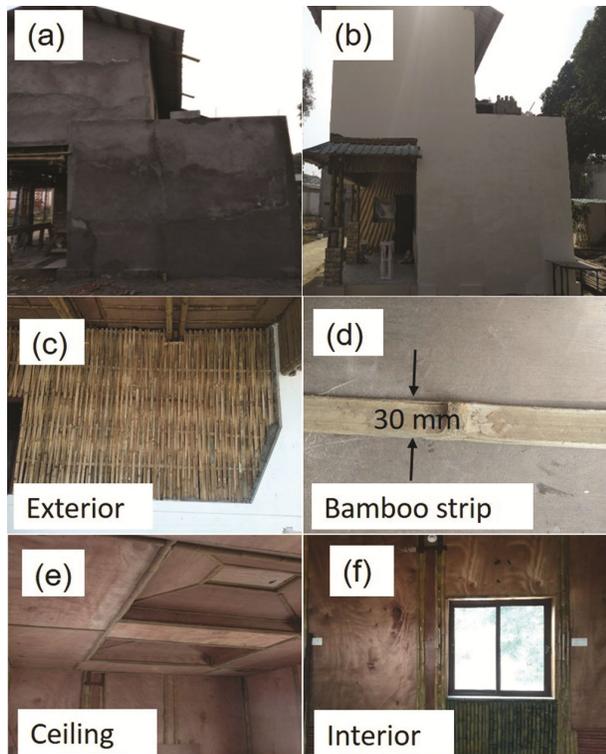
(a), (b) Mortar finishing of bamboo building, (c) exterior wall of bamboo building, (d) bamboo strip dimension, (e) ceiling, and (f) ply wood-based interior.
